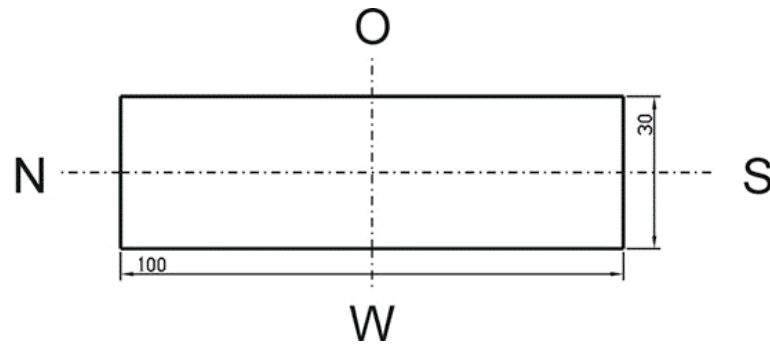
Plan view of the cavern (from Preh et al. 2009)
